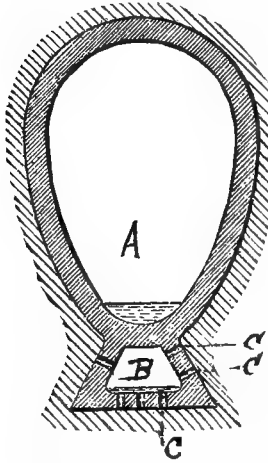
Sewer-pipe of Artificial Stone, with Subsoil Space.
